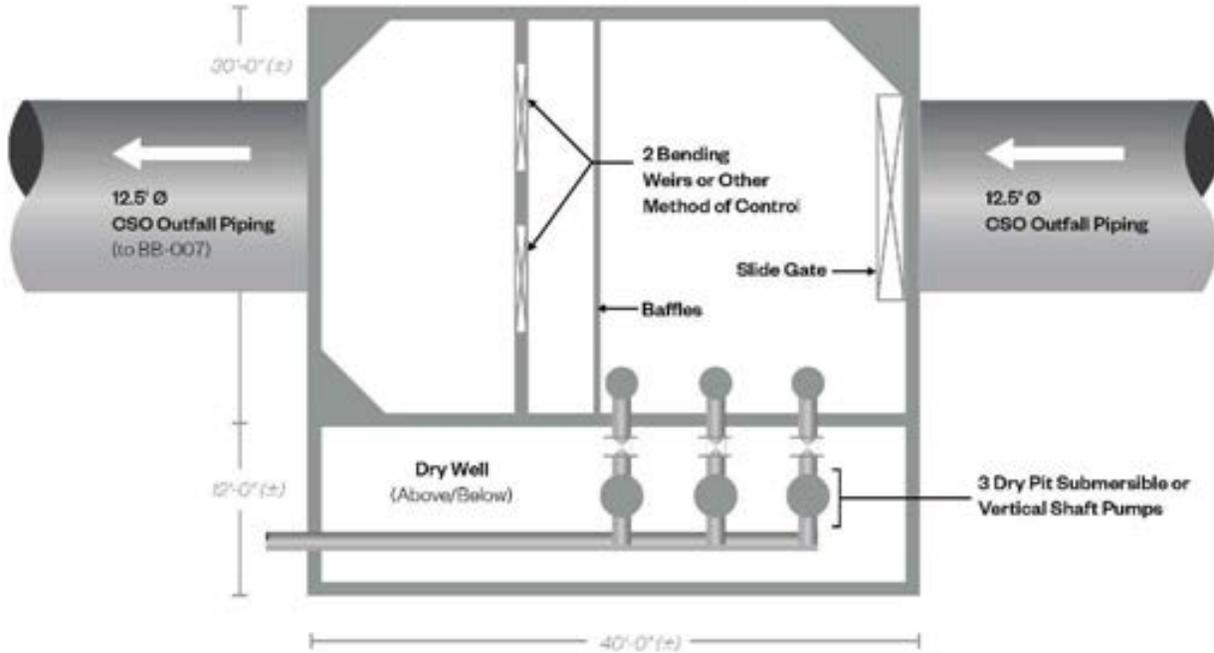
Layout of Alternative 9-3 – Outfall Storage Pumping Station for BB-008
